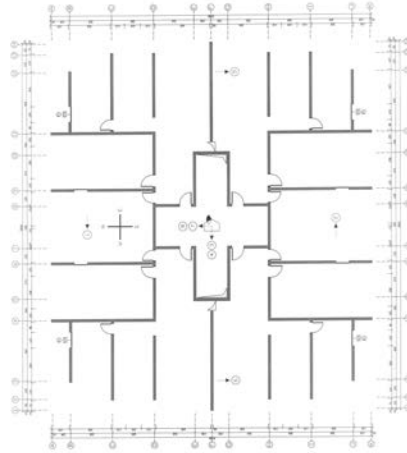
Structural Plan of the Building in Figure 10 (Building Footprint Measures 25x27 m, and Its Height is 25 m)
